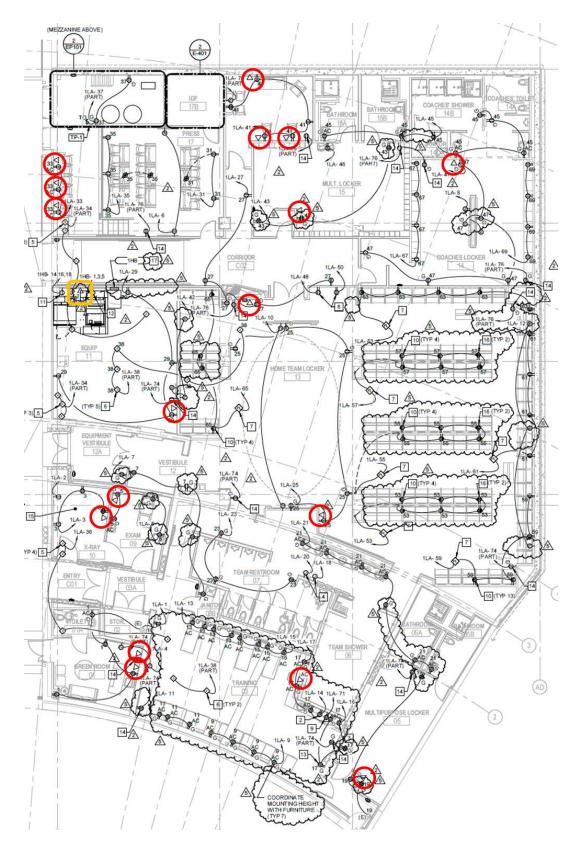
Floor Plan Highlighting Phone/Data Drop Locations (from EP101)
